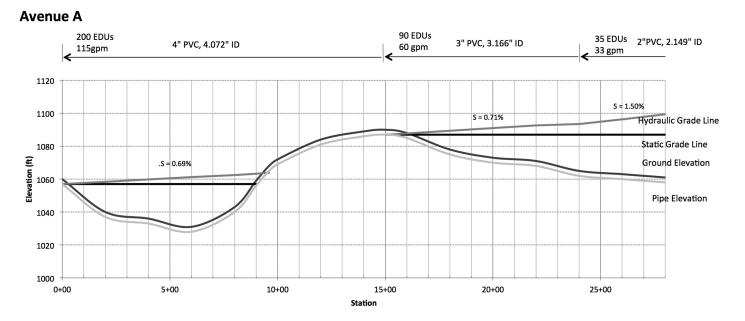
Alternate Profile View with Hydraulic Grade Line for Avenue A
